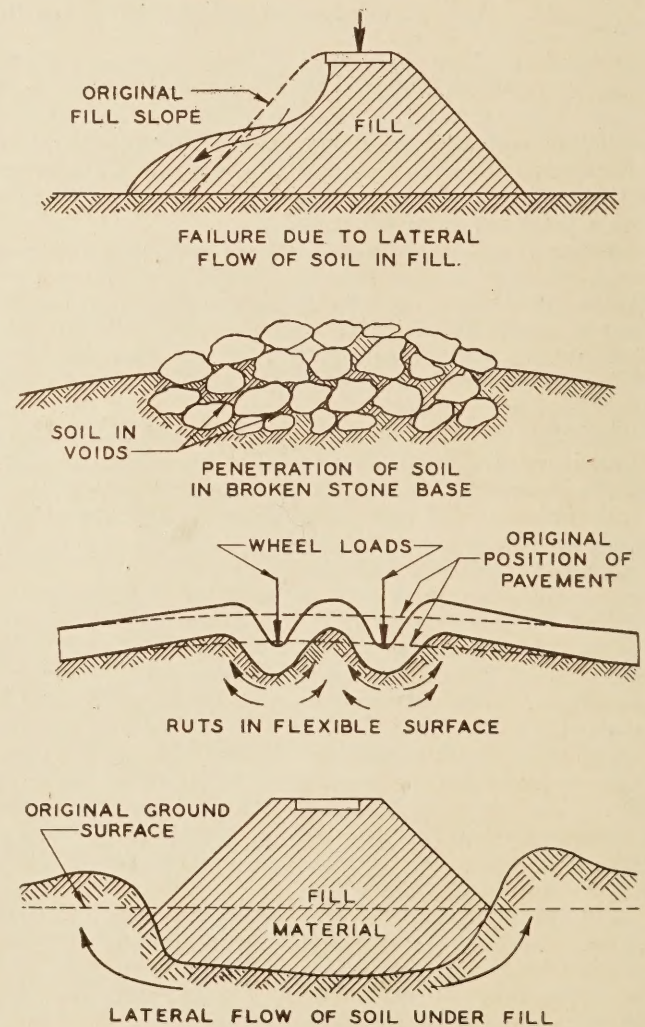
TYPES OF ROAD FAILURE CAUSED BY LATERAL FLOW OF THE SUBGRADE SOIL
